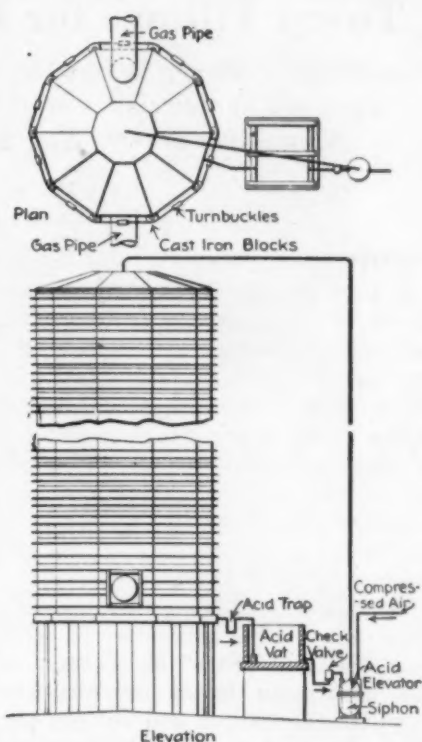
PLAN AND ELEVATION OF GRANITE ABSORPTION TOWERS
